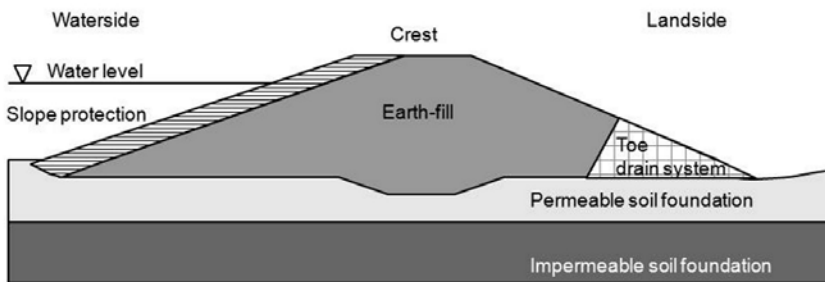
Homogeneous levee with slope protection on thin permeable soil foundation
